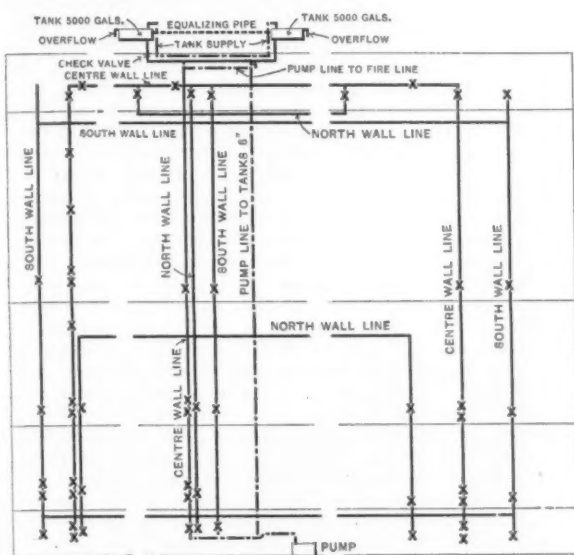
Elevation Showing Fire Protection System and Water Supply to Plumbing System.
